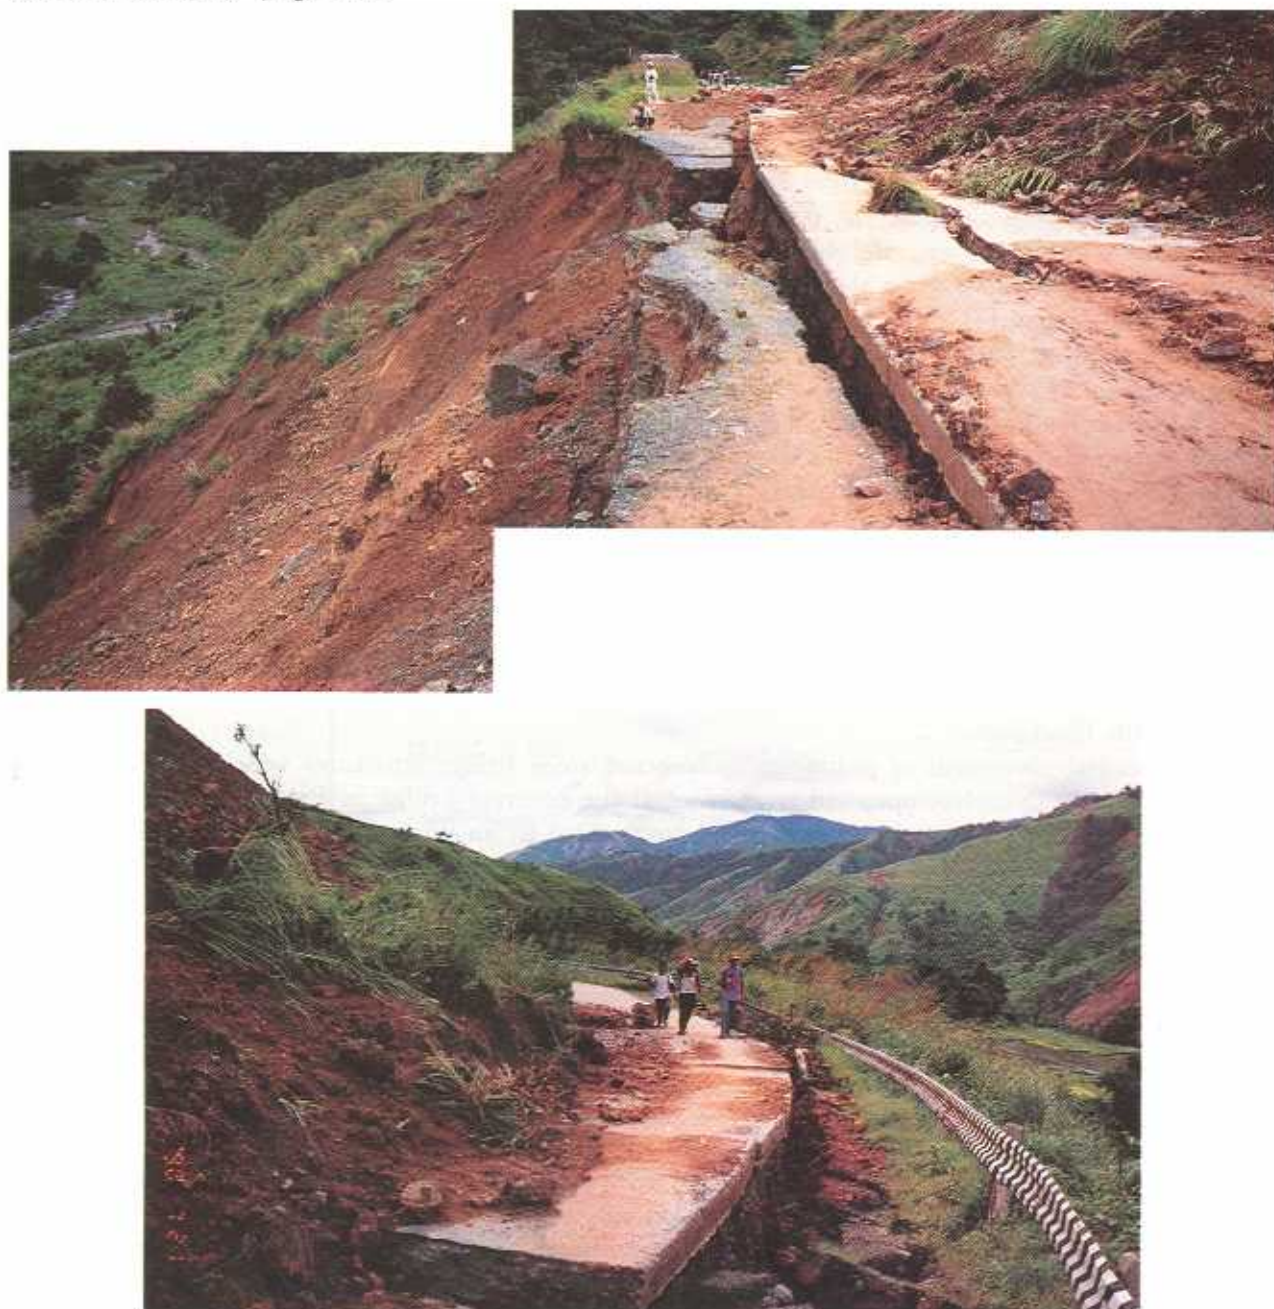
Debris slides along the Dalton Pass Road. Pavement, side slopes, drainage and often the entire road platform were badly damaged. Fissures induced by the quake affected the rigid pavement (top) and the shoulder (bottom), often with irreparable damage of the road surface. (Courtesy of DPWH and Katahira).
